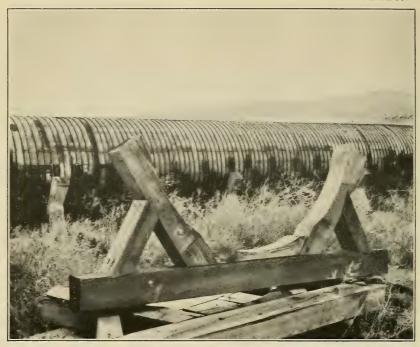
CRADLES USED TO SUPPORT WOOD PIPE, KING HILL PROJECT, IDAHO.
